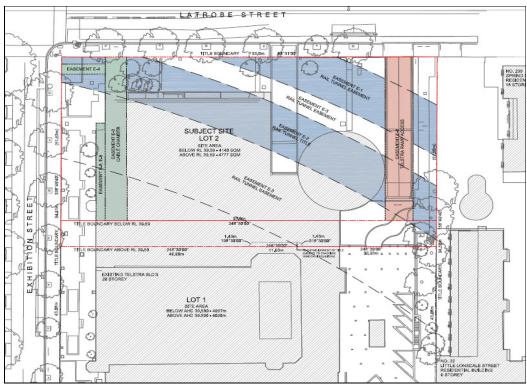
Site plan (Source: Cox and FKA Architectural plans)
